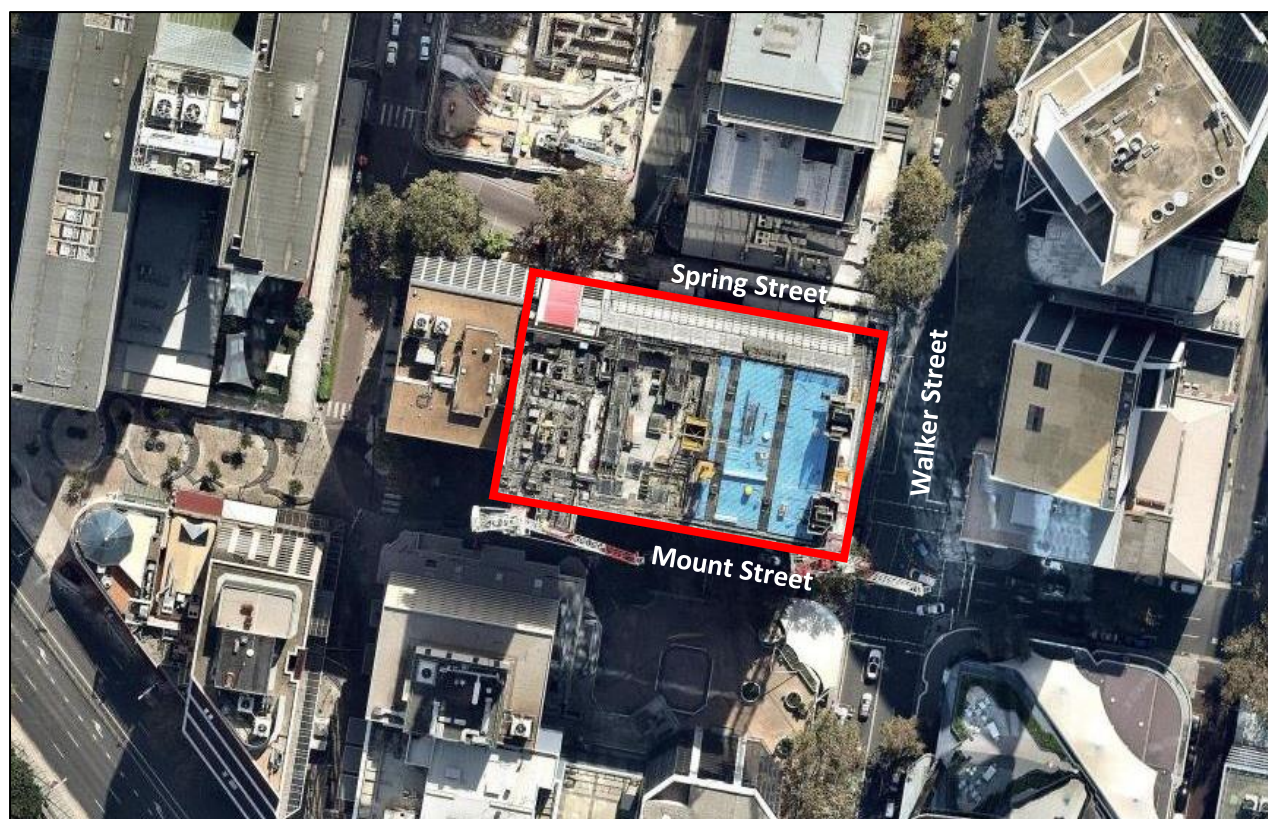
Aerial photo showing construction on the site (Source: Nearmap)
